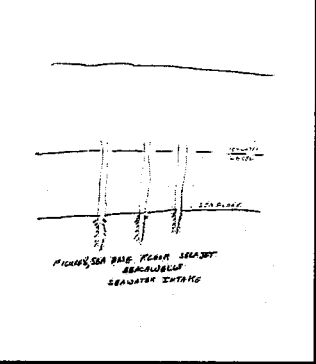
, SEA BED FLOOR SELF JET BERM WALL SEAWATER INTAKE
